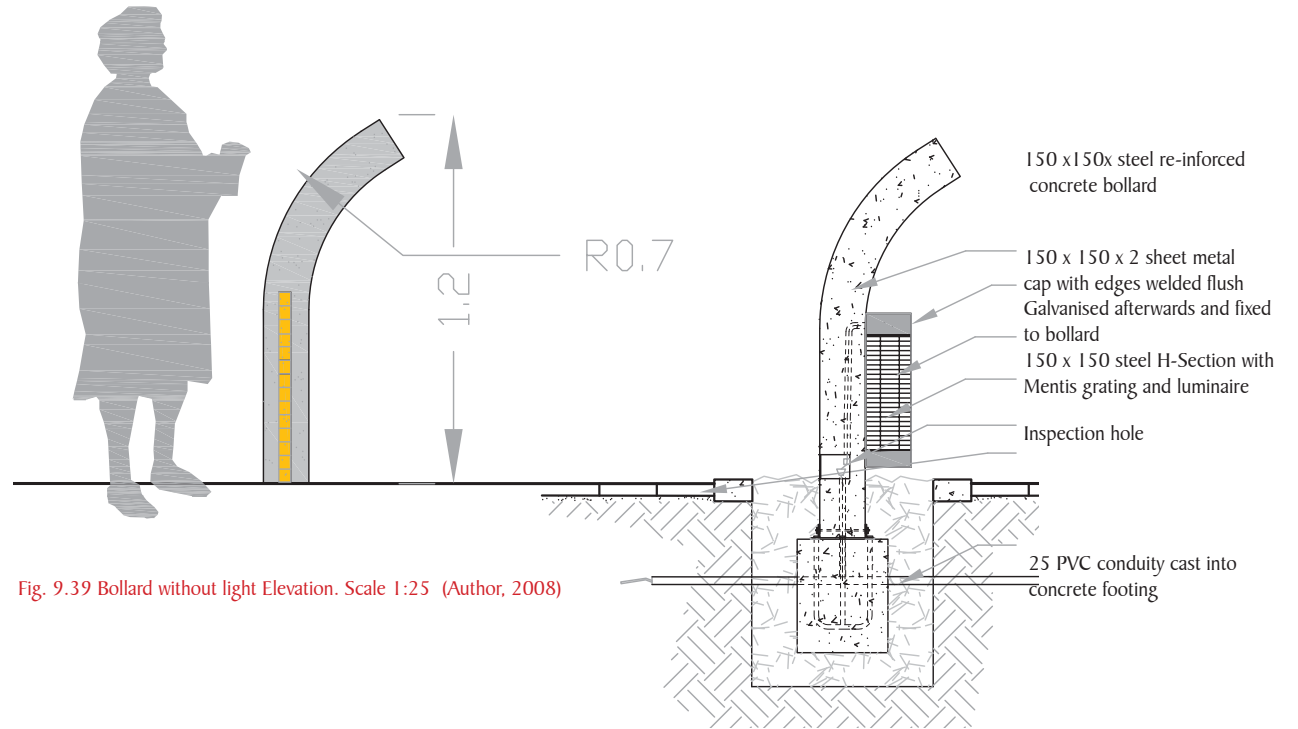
Bollard without light Elevation. Scale 1:25 (Author, 2008)
